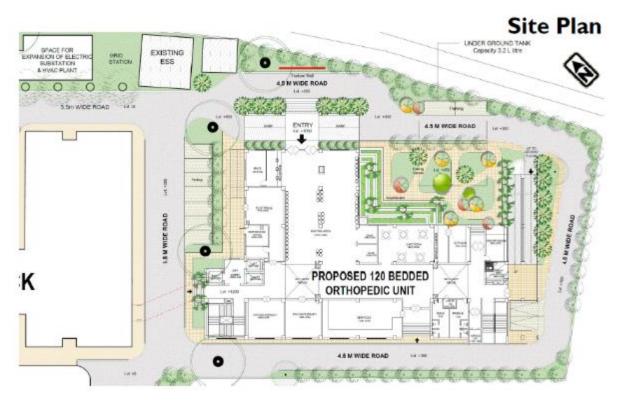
Existing Site Layout and location of Proposed 120 Bedded Hospital
